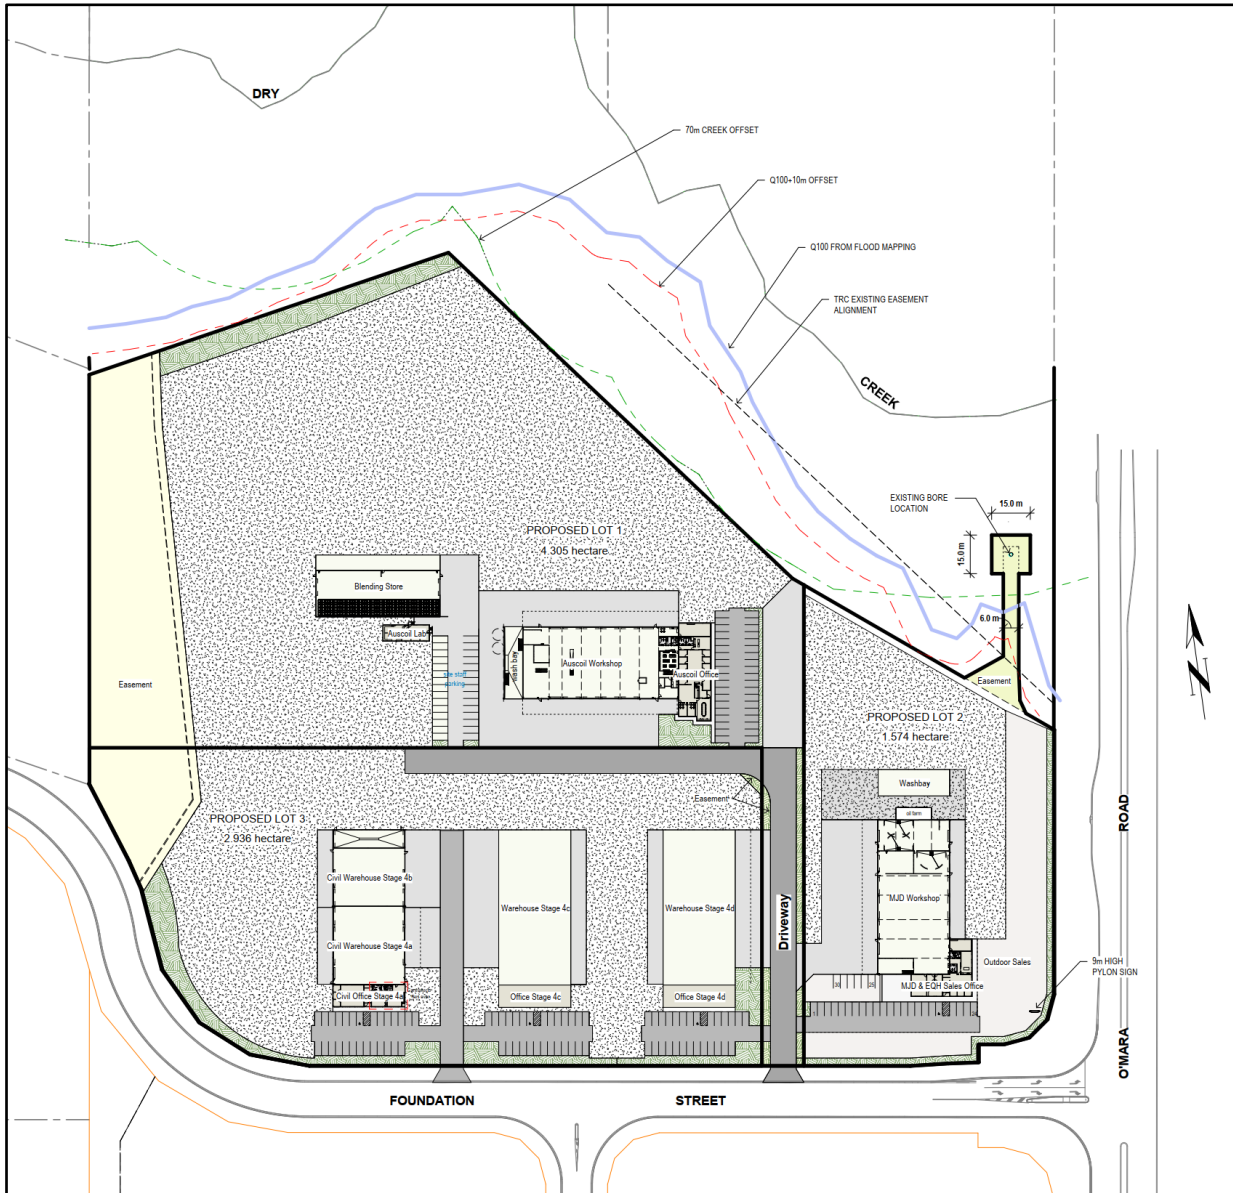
SITE PLAN (FKG DRAWING: 2570-001)
